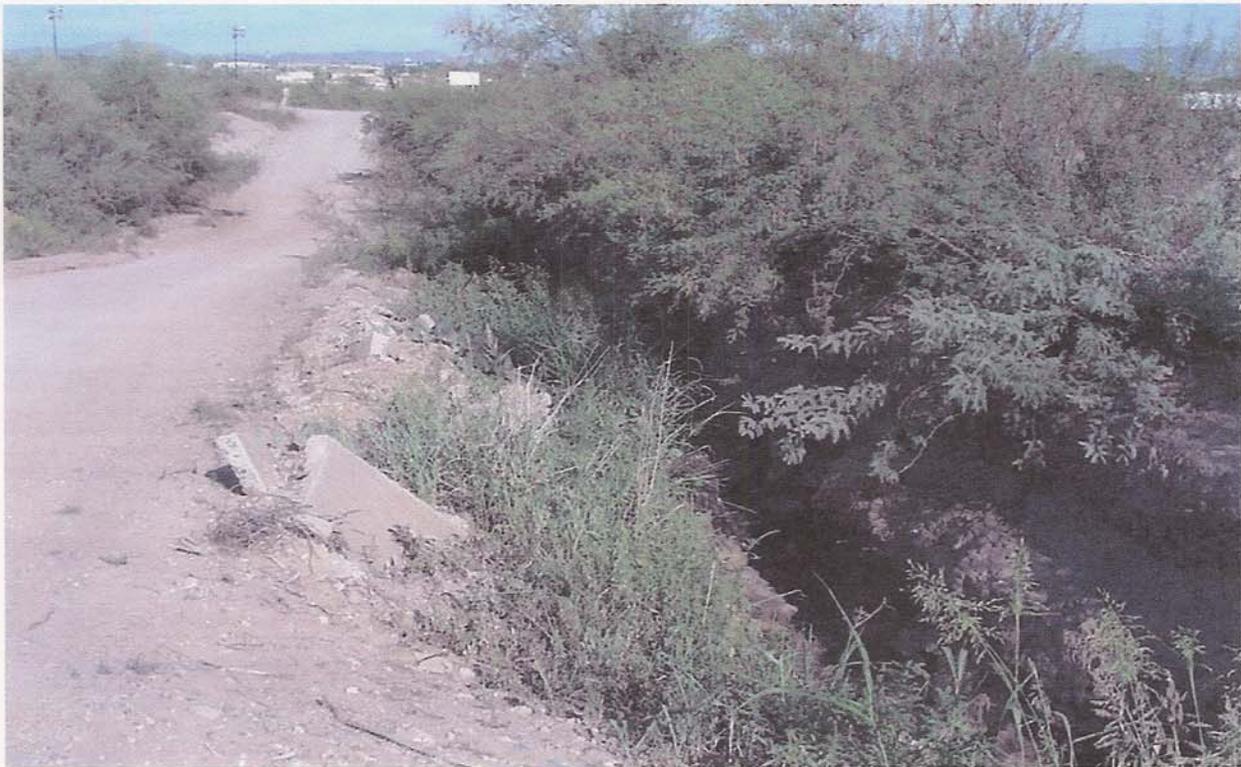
View of western portion of proposed road maintenance and hydrological improvement section. Photo taken facing east.
